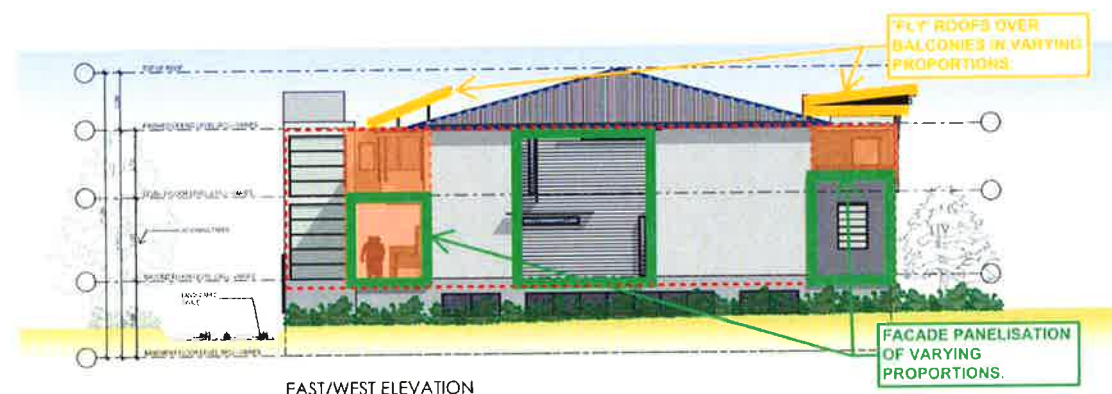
Typical Apartment Block Side (East/West) Elevation Detail Elements
